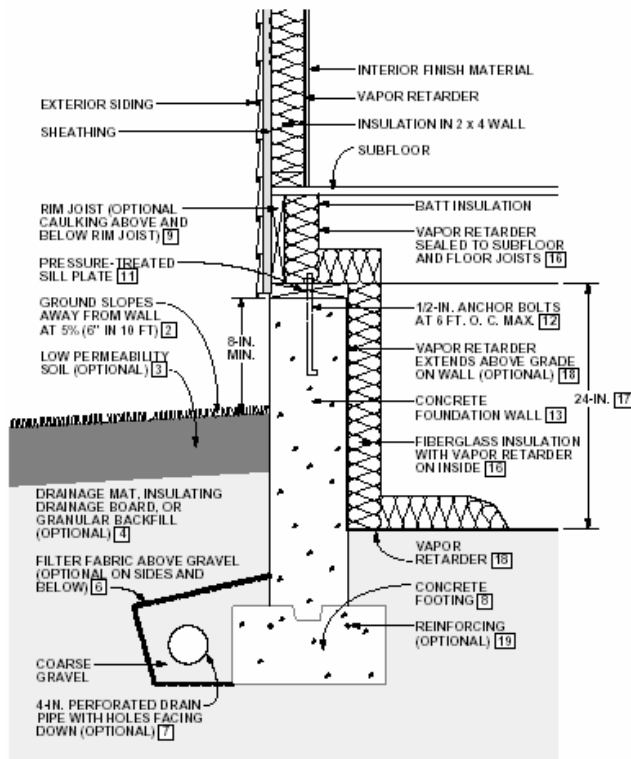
illustrates an unvented crawl space with a concrete foundation wall. Batt insulation is placed vertically on the interior wall and extends horizontally onto the perimeter of the floor. The crawl space floor is below the level of the surrounding grade. A perimeter drainage system is shown.
